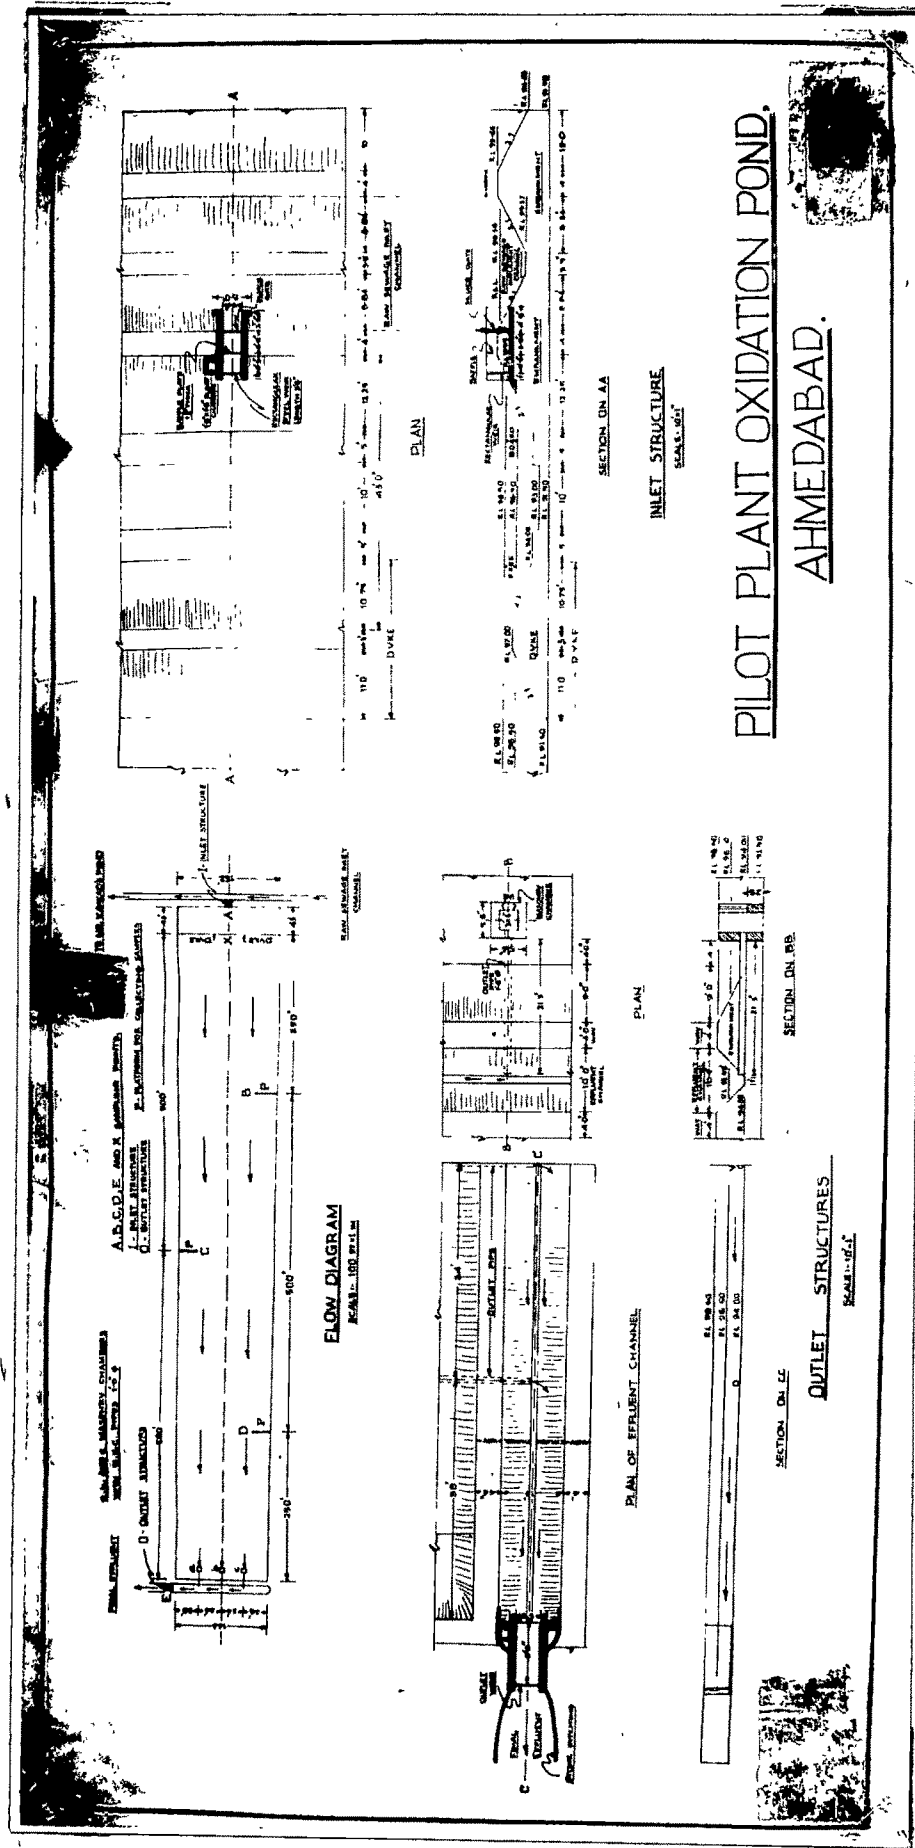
Plan and section of the Pilot Plant Oxidation Pond in the Pirana Sewage Farm.
